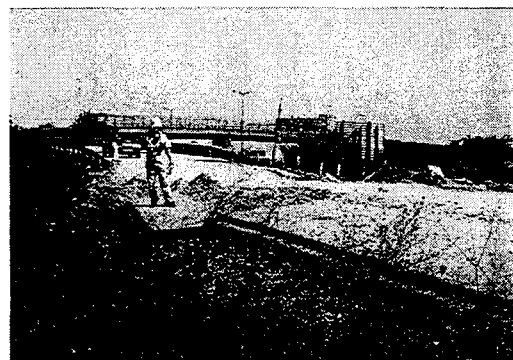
Minor Damage in an Overpass where the Fault Crossed the Overpass at Its Abutment
